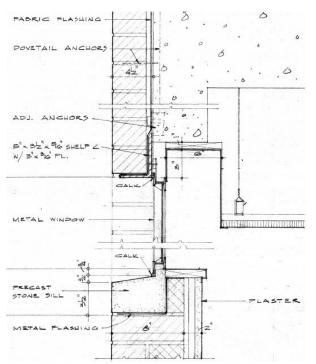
Section through typical exterior wall in existing building. From A.12: Window & Wall Sections
